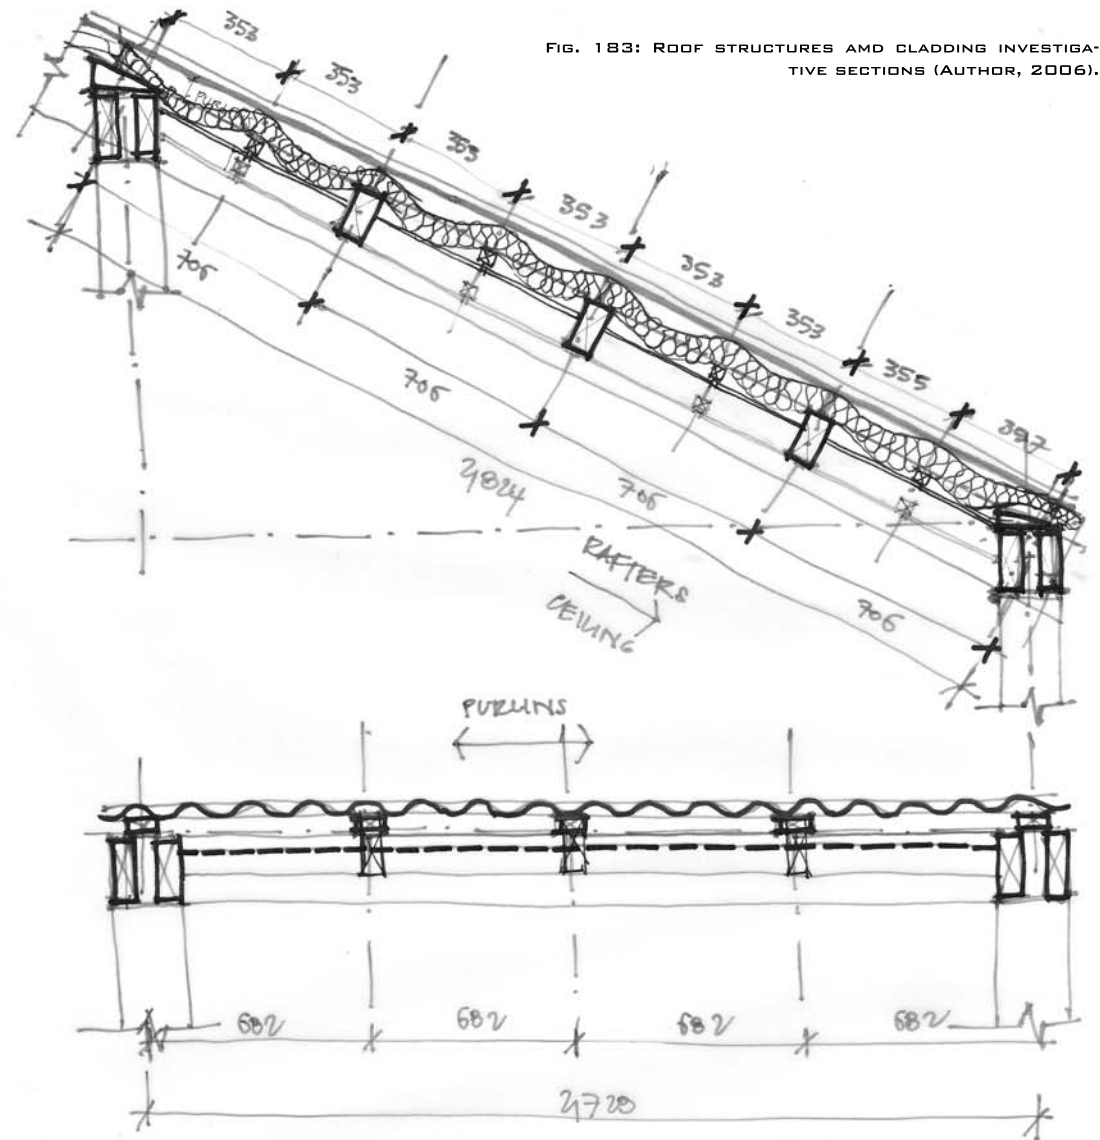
ROOF STRUCTURES AND CLADDING INVESTIGATIVE SECTIONS (AUTHOR, 2006).
